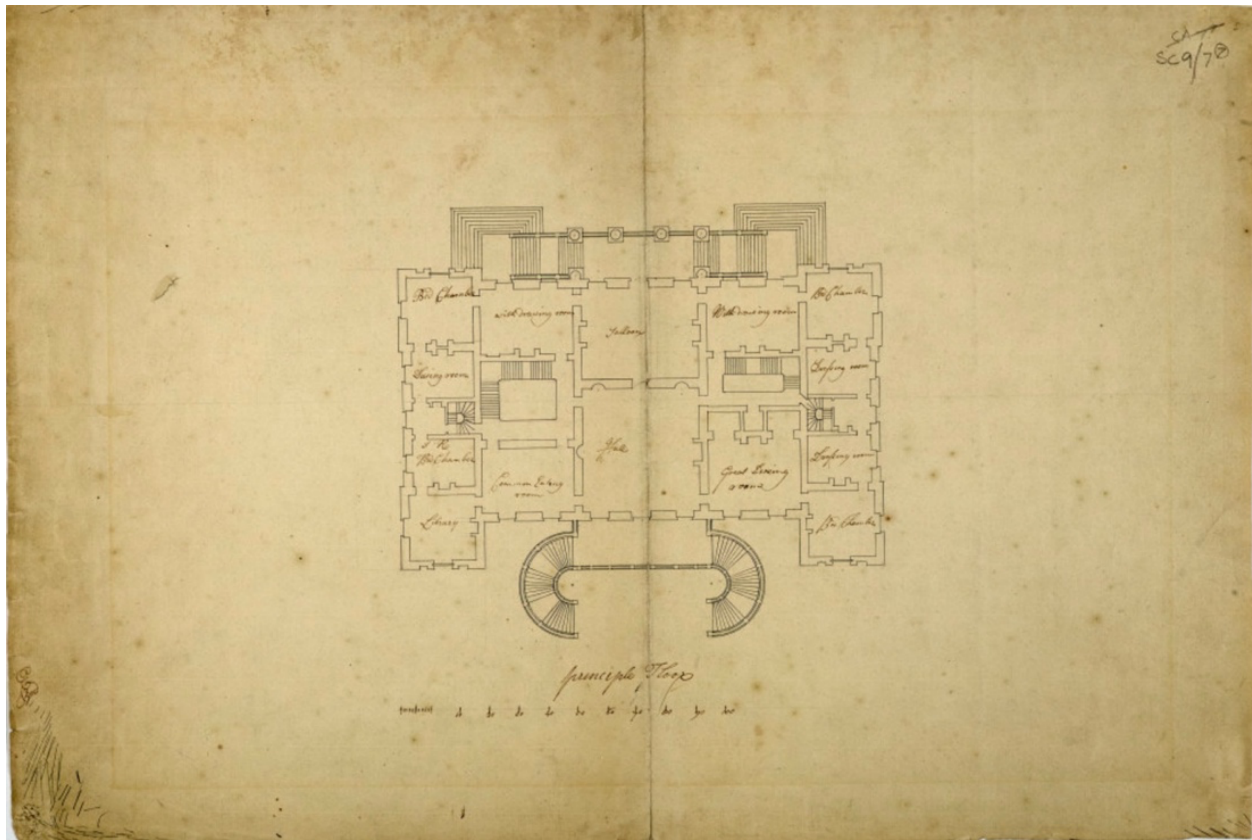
Plan of the Principal Floor, Houghton Hall, drawing made by James Gibbs, before 1723 (?). Royal Institute of British Architects.
